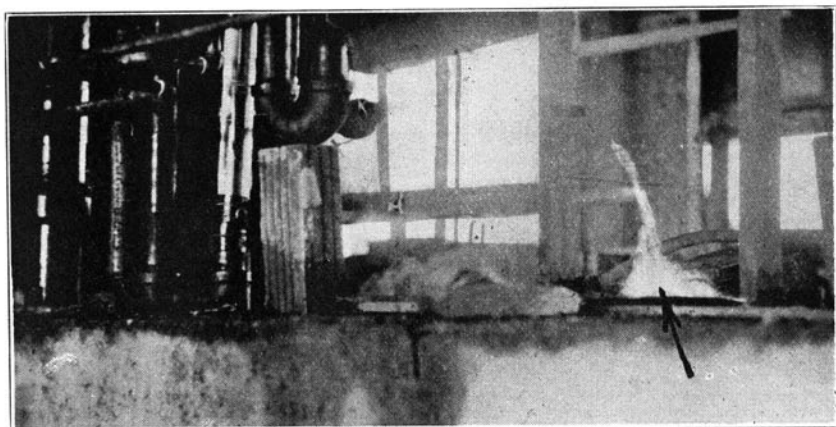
WATER LEAPING INTO AIR FROM FLOOR DRAIN ON 12TH FLOOR OF RIDGLEY FARMERS STATE BANK BUILDING
